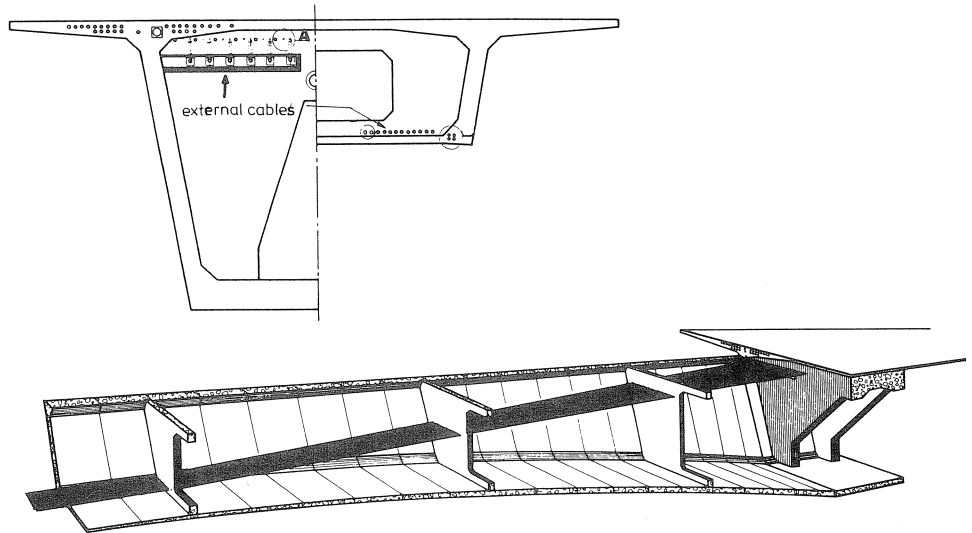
Box girder prestressed with external tendons; taken from [49].
